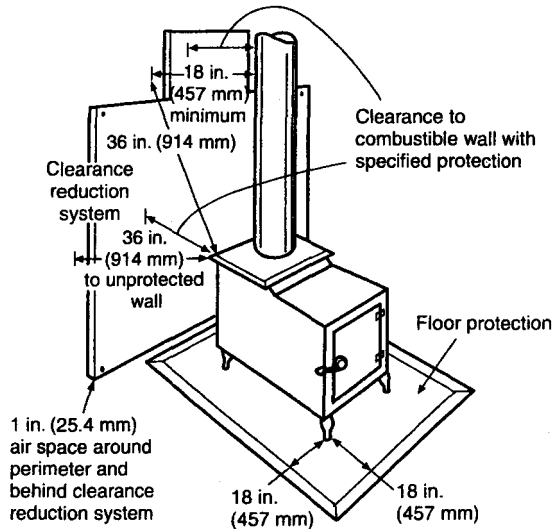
(b) Distance to Combustible Wall/Floor.
